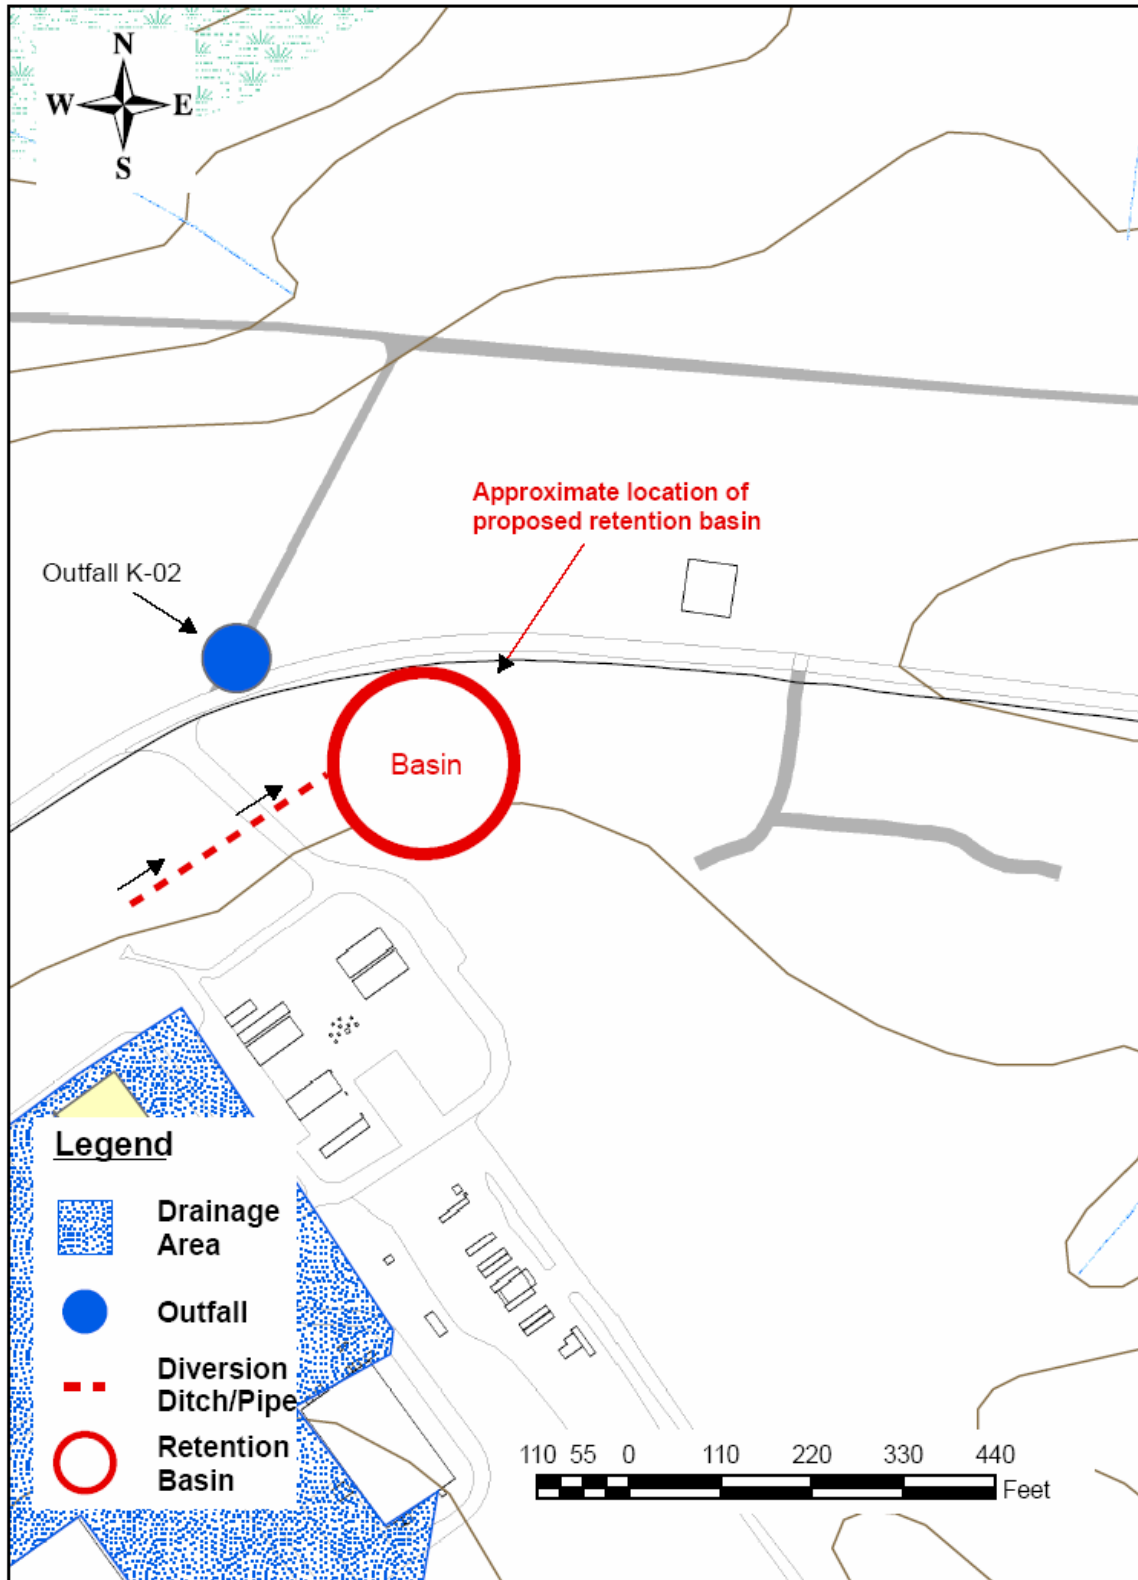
Outfall K-02, Option B: Extended Outfall Channel With Retention Basin.
